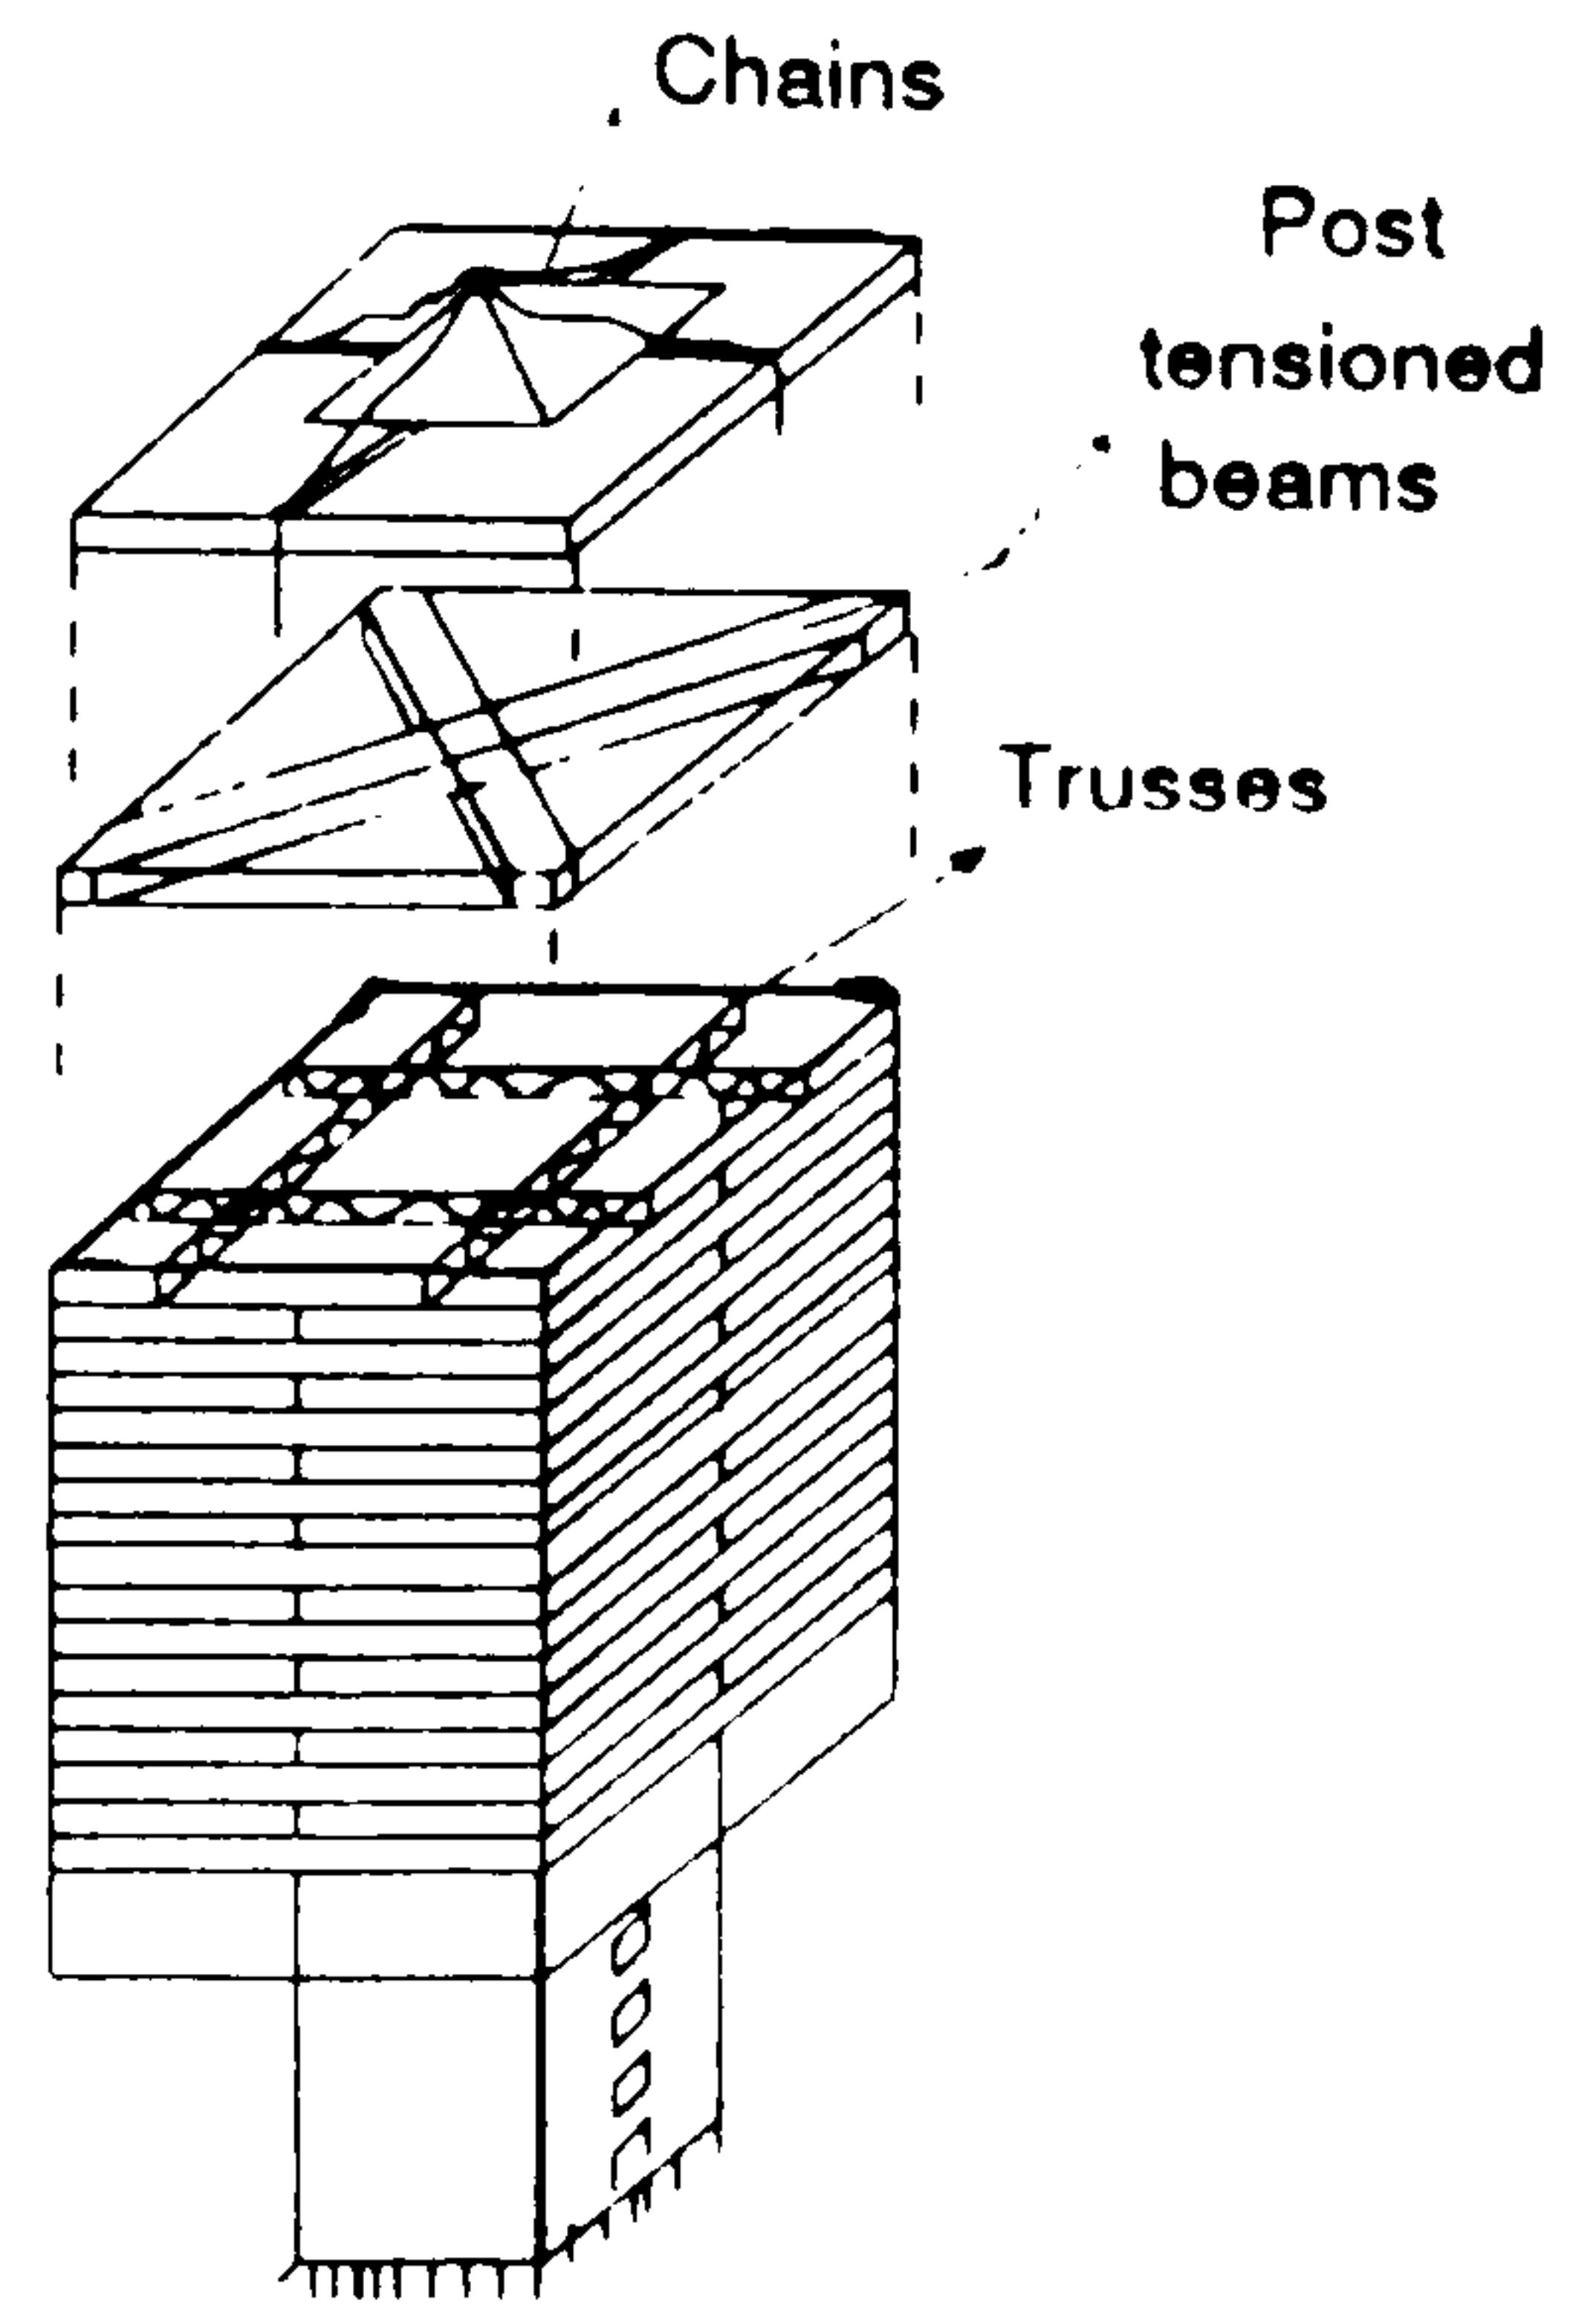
Basic structural form of tall buildings. Irwin [7]
